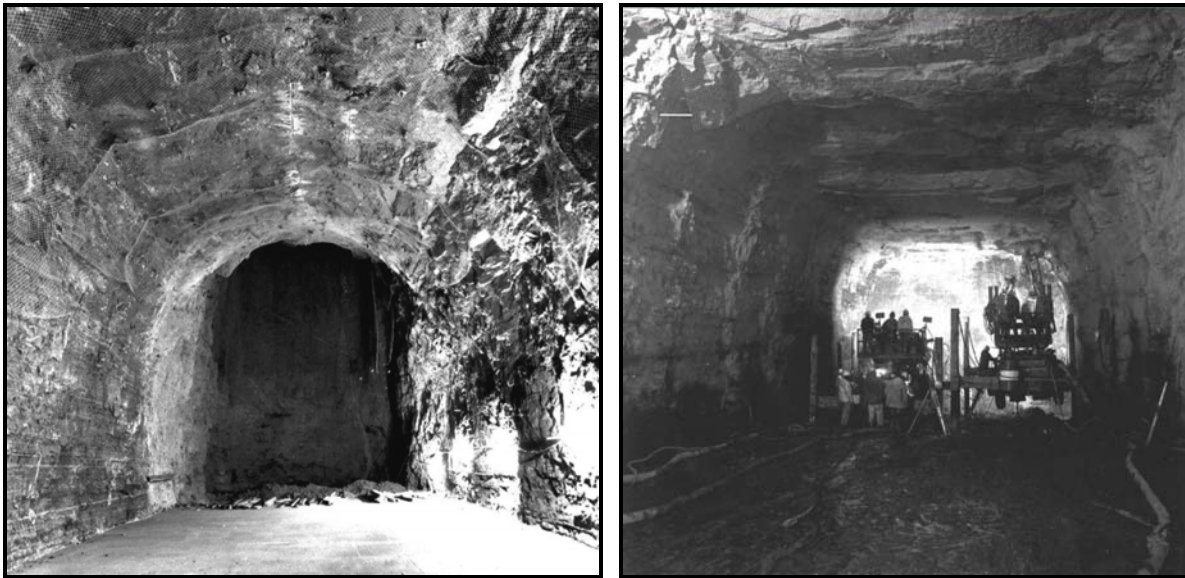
Darlington NGS Intake Tunnel (left) and Wesleyville Access Tunnel (right)
